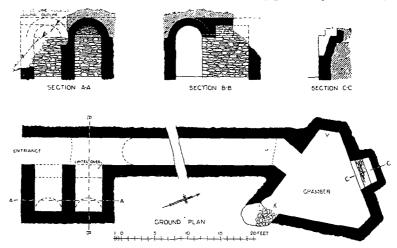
Plan and Sections of Underground Structure at Auchencass Castle, Dumfriesshire.
